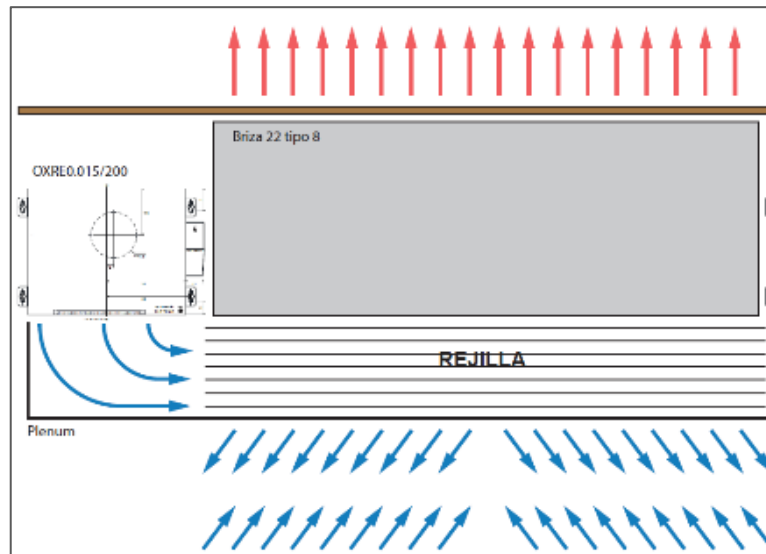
Wall-mounted fan coil and fan configuration (source: JAGA).
